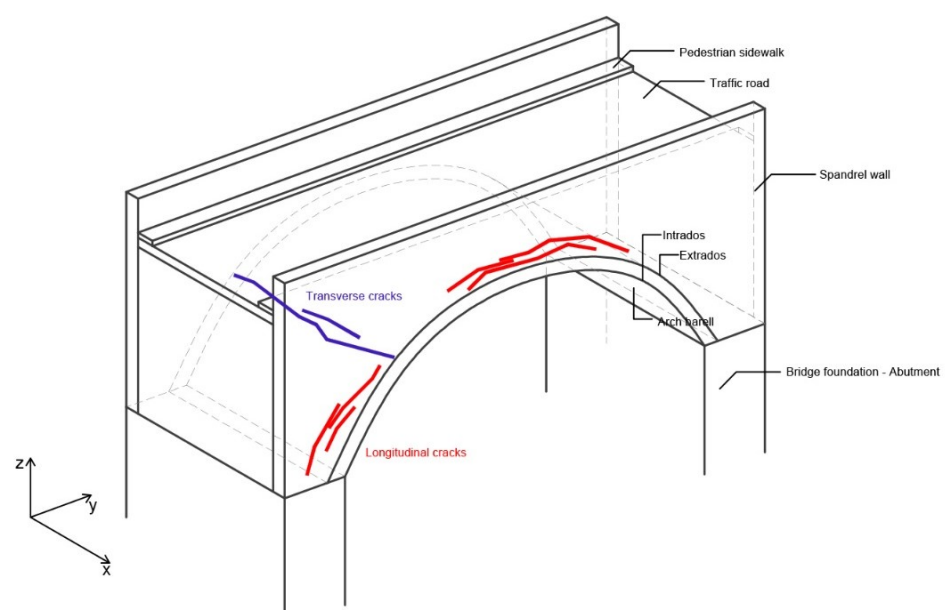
Three-dimensional scheme of possible position of transverse and longitudinal cracks in masonry arch bridges due to most common causes of cracks.
